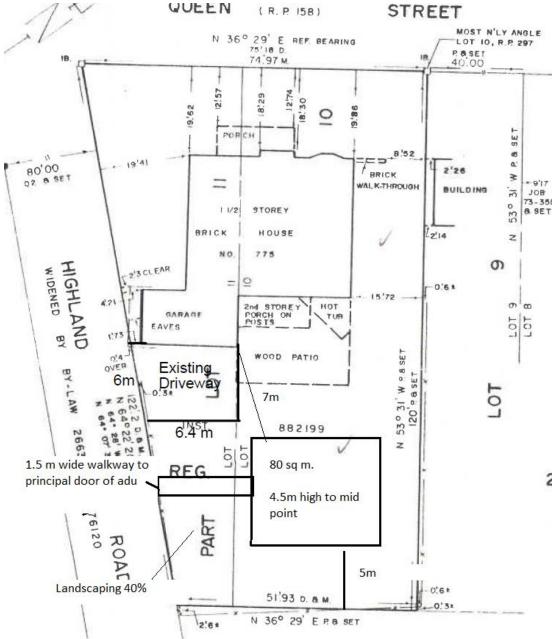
Site Plan for Additional Dwelling Unit (Detached)
